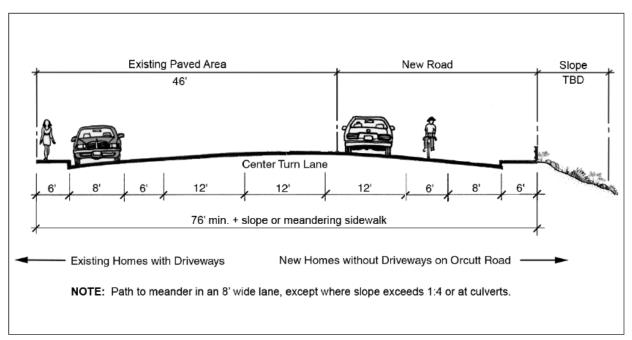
A ORCUTT ROAD FROM JOHNSON AVENUE TO HANSEN LANE
